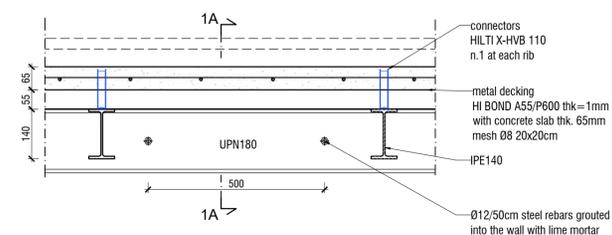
NEW TERRACE AT ROOM 6
